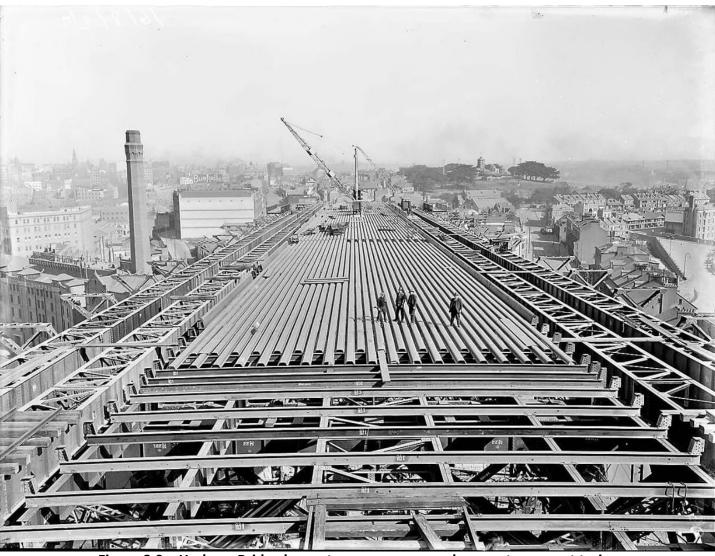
Harbour Bridge heavy trusses on approach spans to support trains
